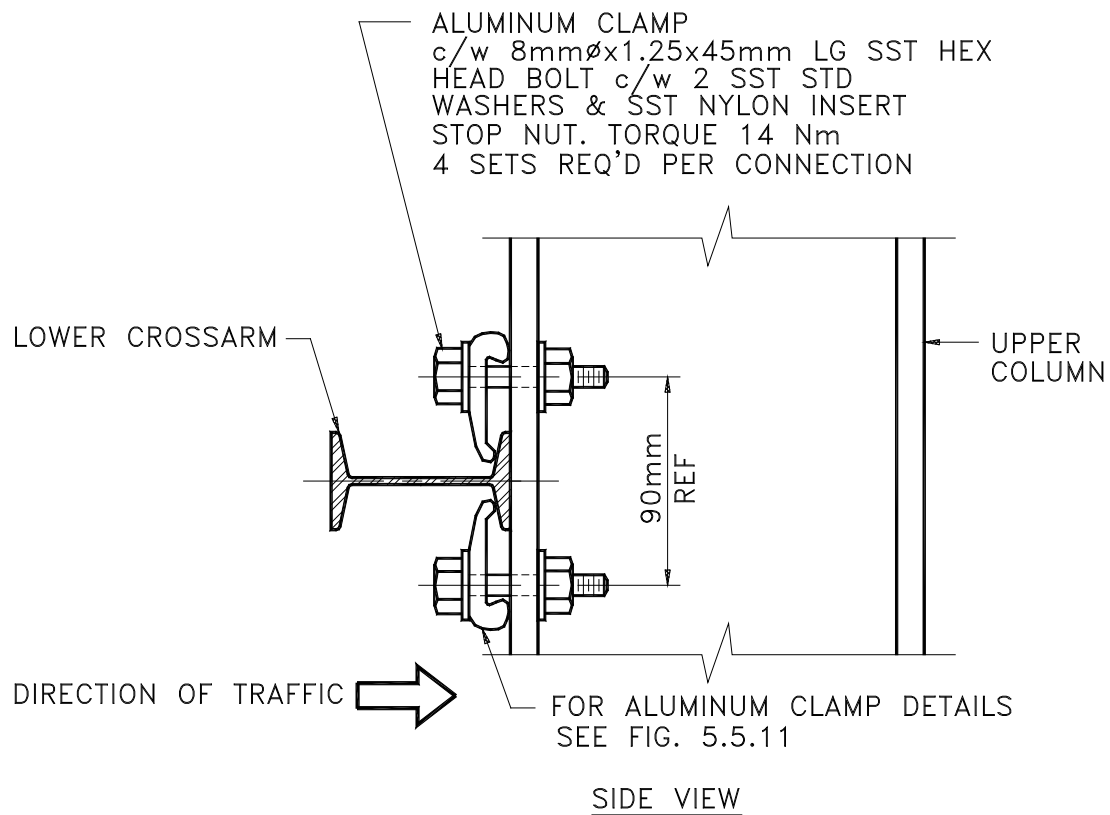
LOWER CROSSARM CONNECTION
